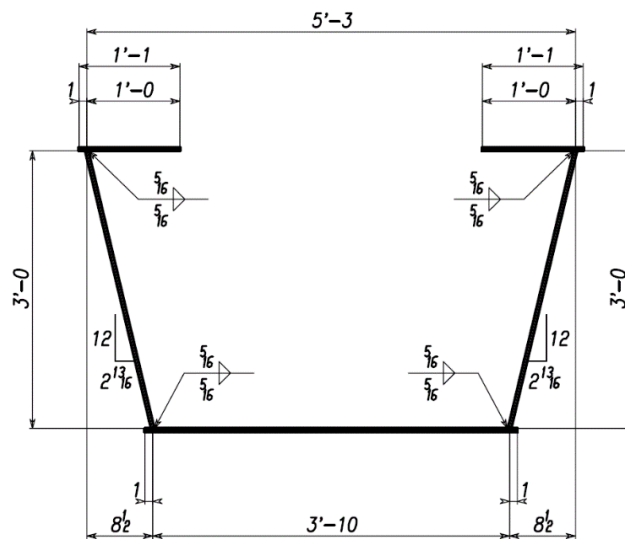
Full-Scale Offset Top Flange Tub Girder Specimen - Cross Section
